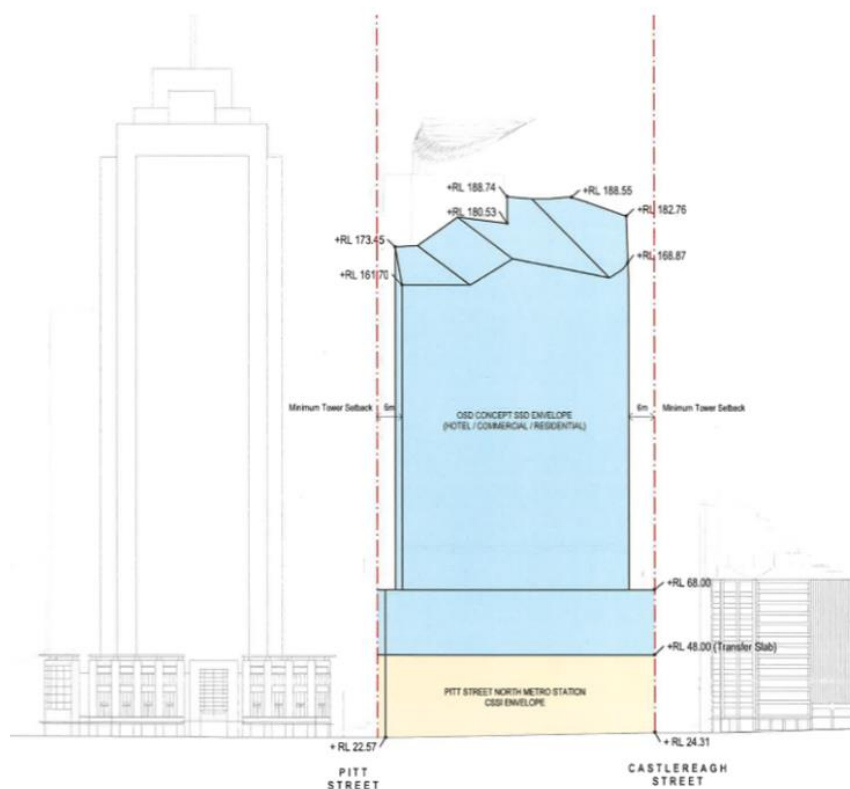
Pitt Street North Concept SSD DA – Envelope – South Elevation
